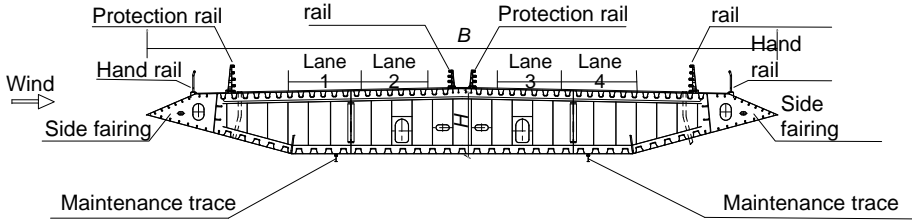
Cross-section of a completed bridge deck (from [35]) (Reproduced with permission from Elsevier).
